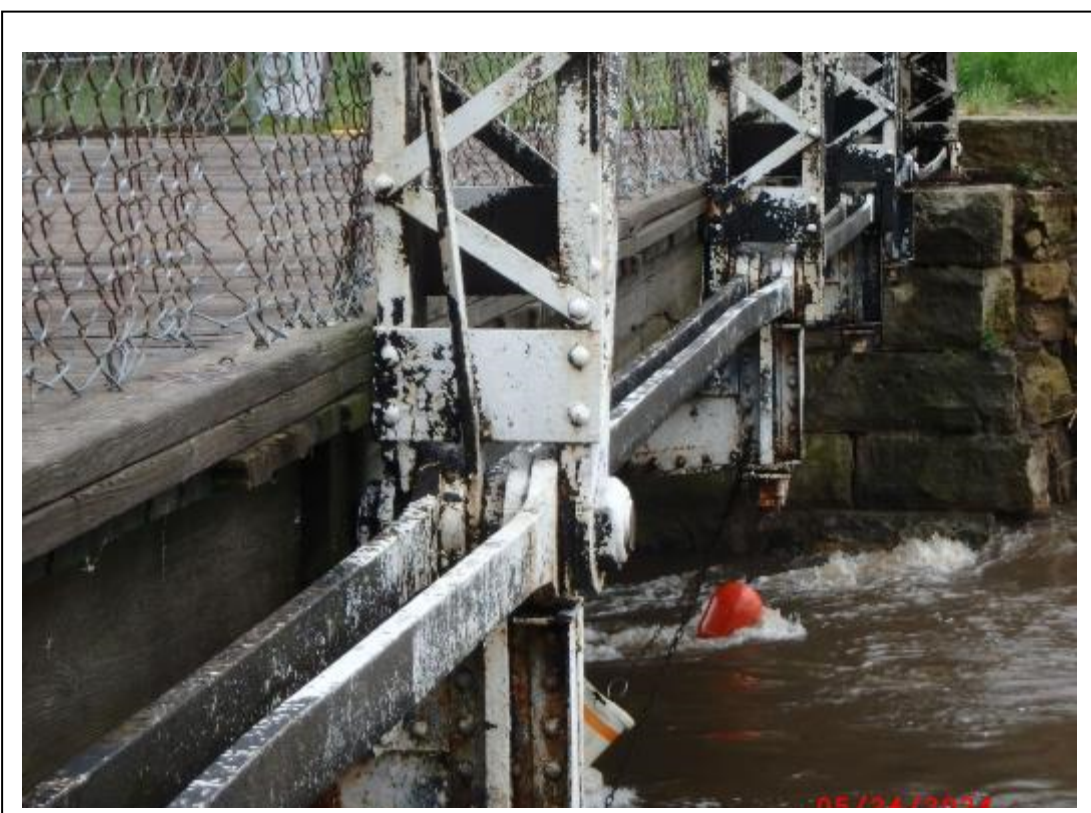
PANELS 1-5 – TRUSS, WEST BOTTOM CHORD EYEBARS
